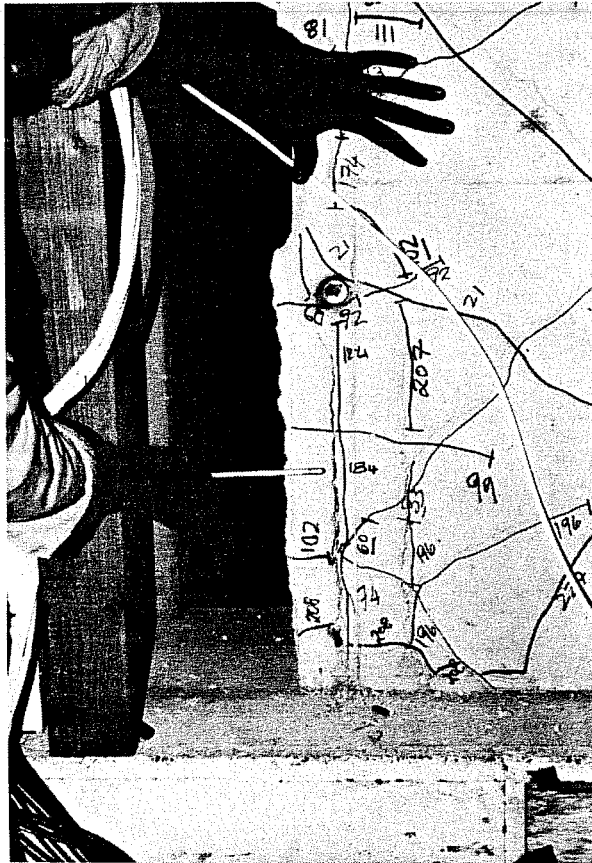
Anchorage Failure of Vertical Trim Steel
